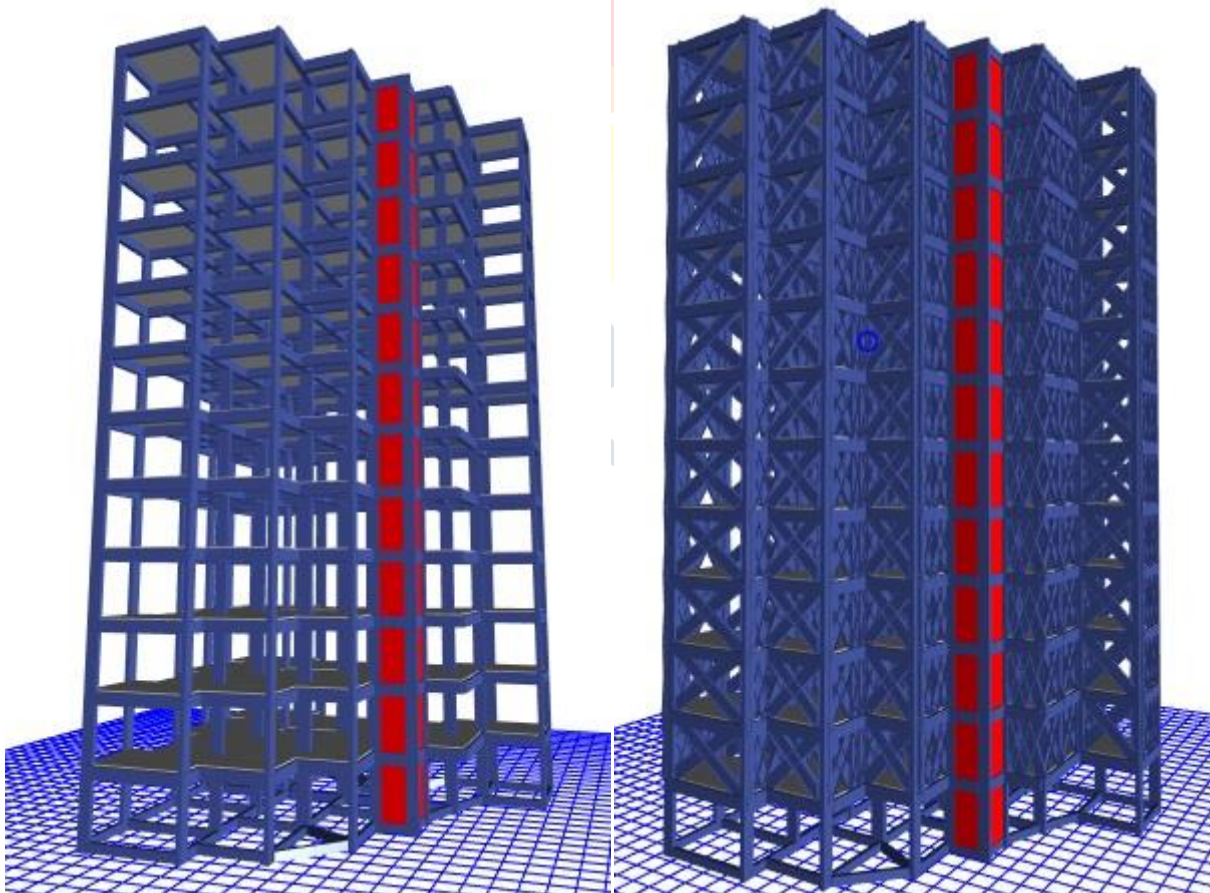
Irregular plan bare frame & equivalent diagonal strut model
